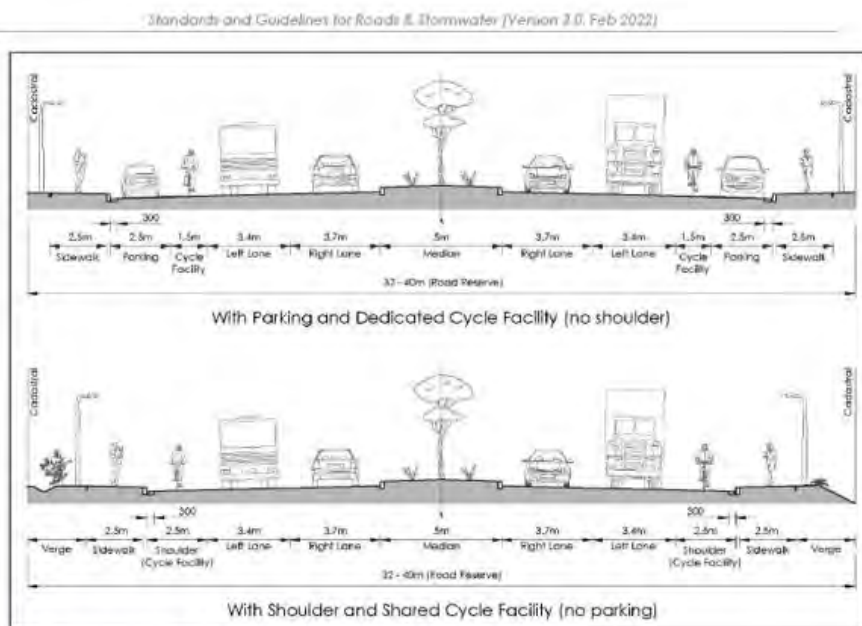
Typical Cross Sections of a Class 3 Minor Arterial road
